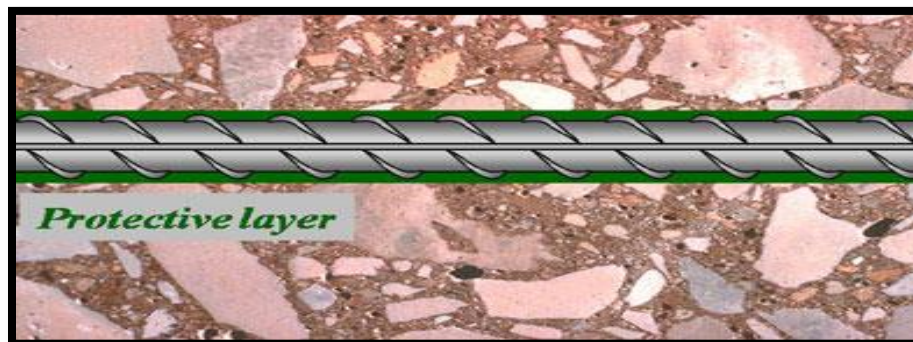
Concrete as a protective layer around steel in RC Structures
